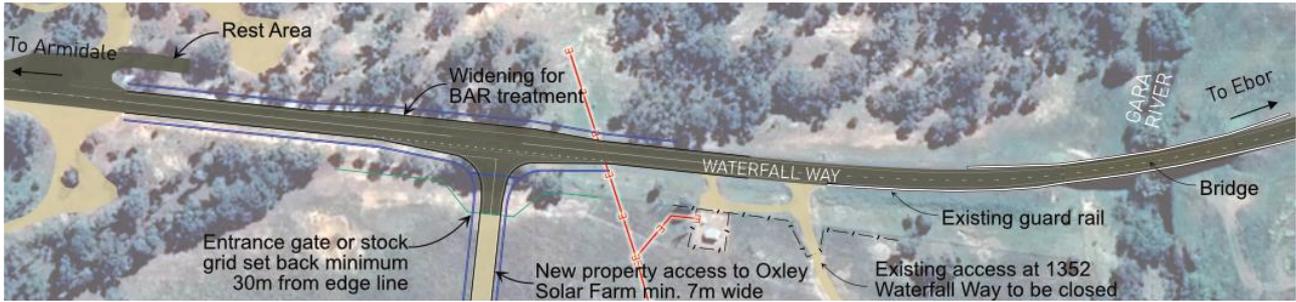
Concept Diagram of New Property Access Arrangement to Waterfall Way (Grafton Road).
